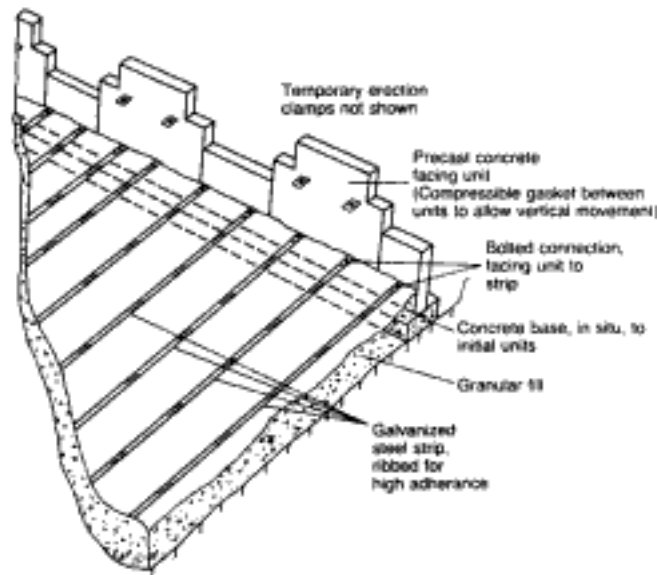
Reinforced Earth wall during construction showing reinforcing strips and precast concrete facing units (courtesy of Reinforced Earth Ltd)
